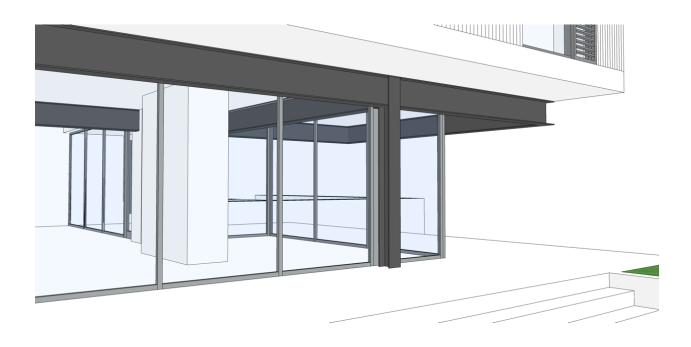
Proposed detail of the glass enclosure of ground floor living space built on grade as a recessed glass box, inside the steel columns, consistent with the character of the original design.
